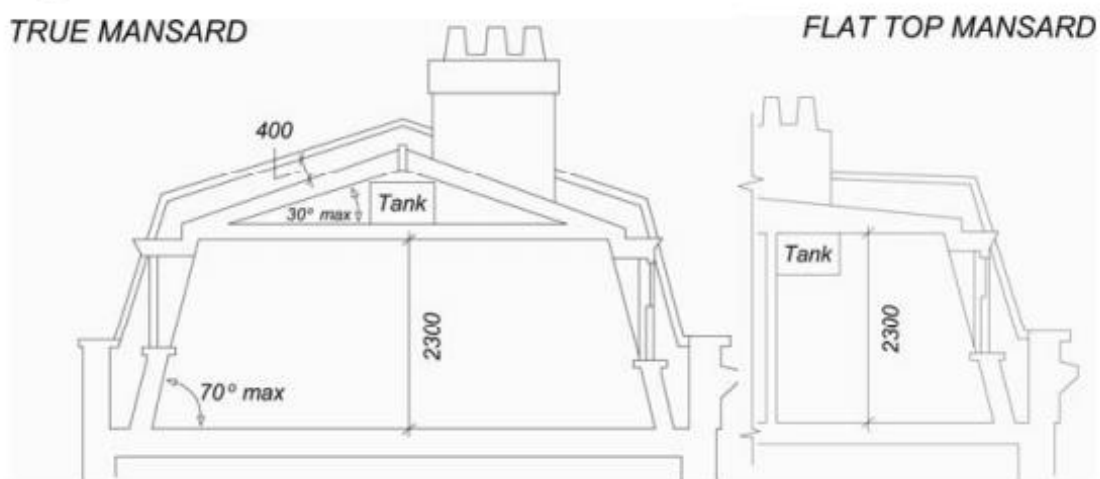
Camden's CPD 1 Design guidance on mansard roof extensions
